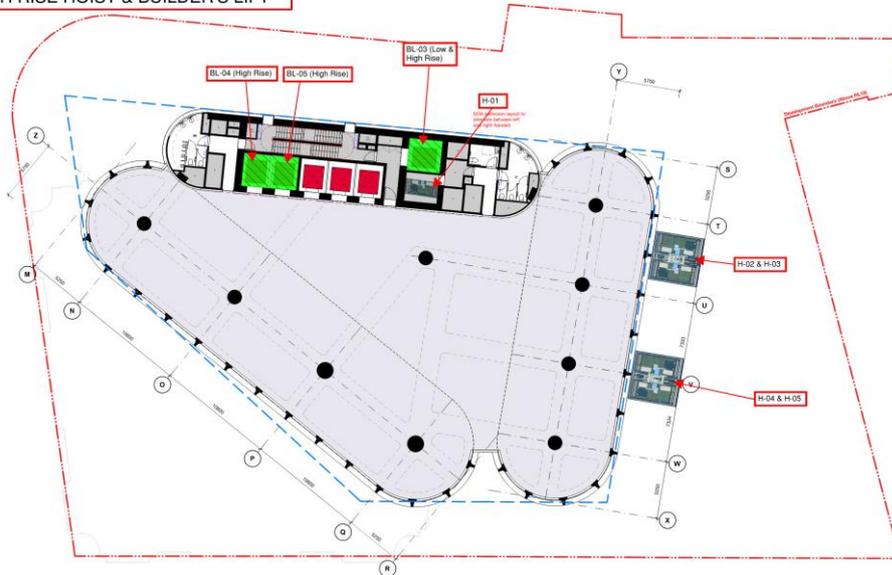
Hoist and Builders Lift Draft layout
